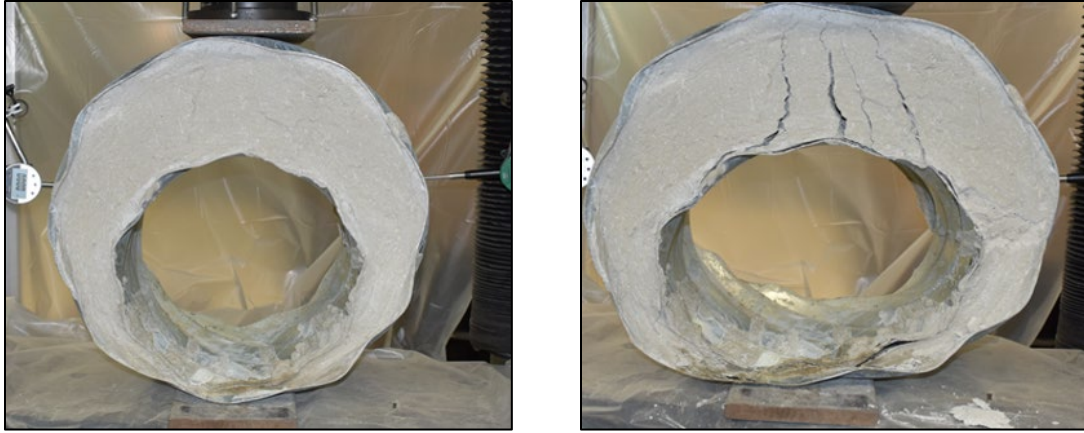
Sliplined Culvert using C40 Cellular Grout Mix, Before (*left*) and After (*right*) Parallel-plate Load Test.
